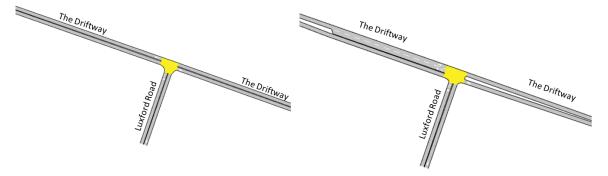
The Driftway and Luxford Road intersection (Location 11) – Existing layout (left) and proposed upgrade (right)
